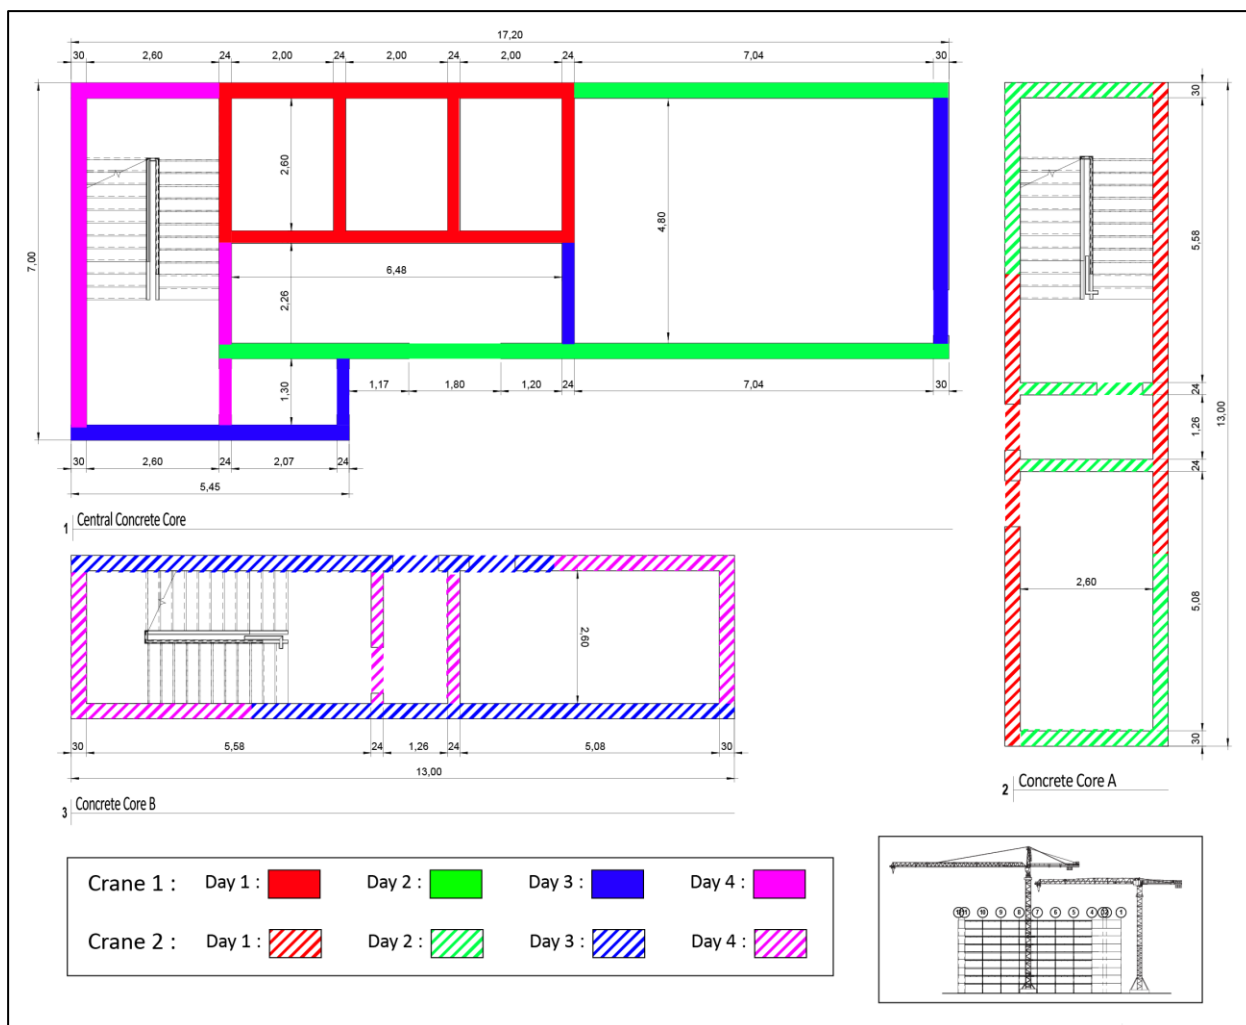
Daily rotation plan of the concrete cores building, with the use of 2 cranes
